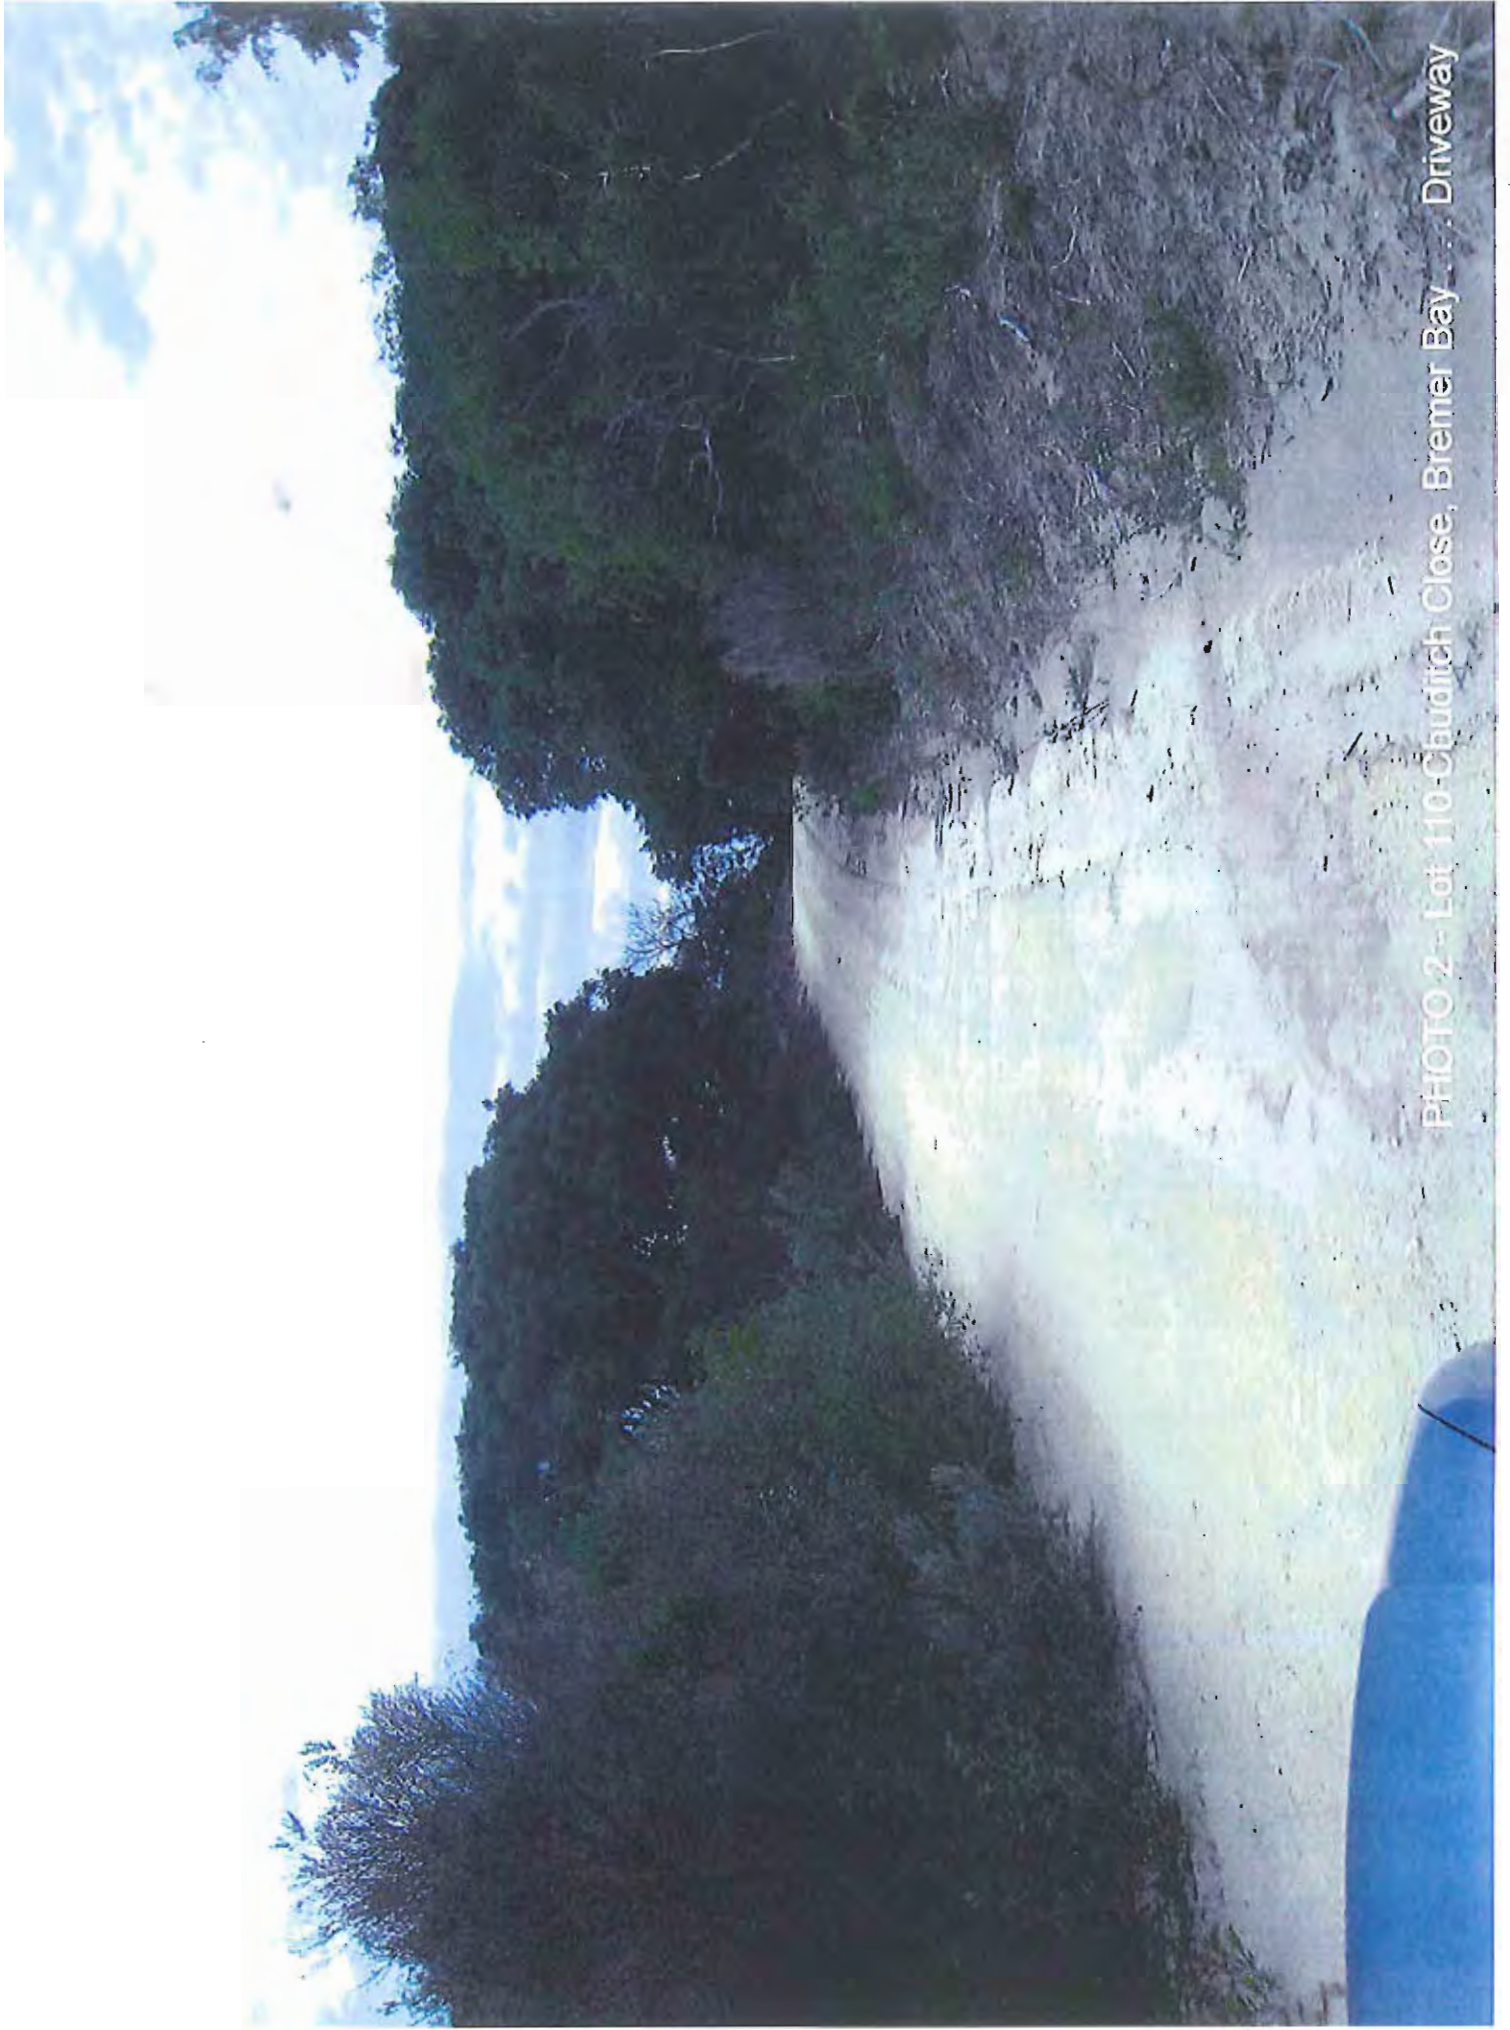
Lot 110-Clauditch Close, Bremer Bay ... Driveway
